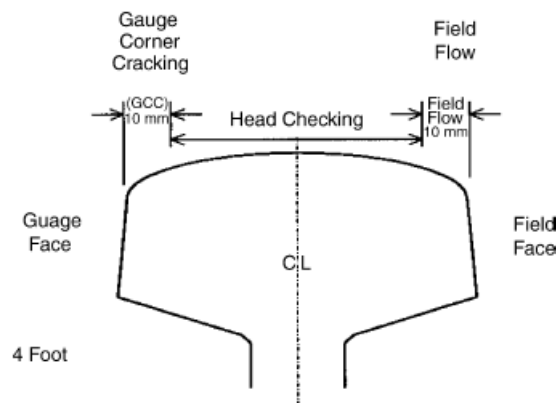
Head Checking (HC) and gauge corner cracking (GCC) [48]
